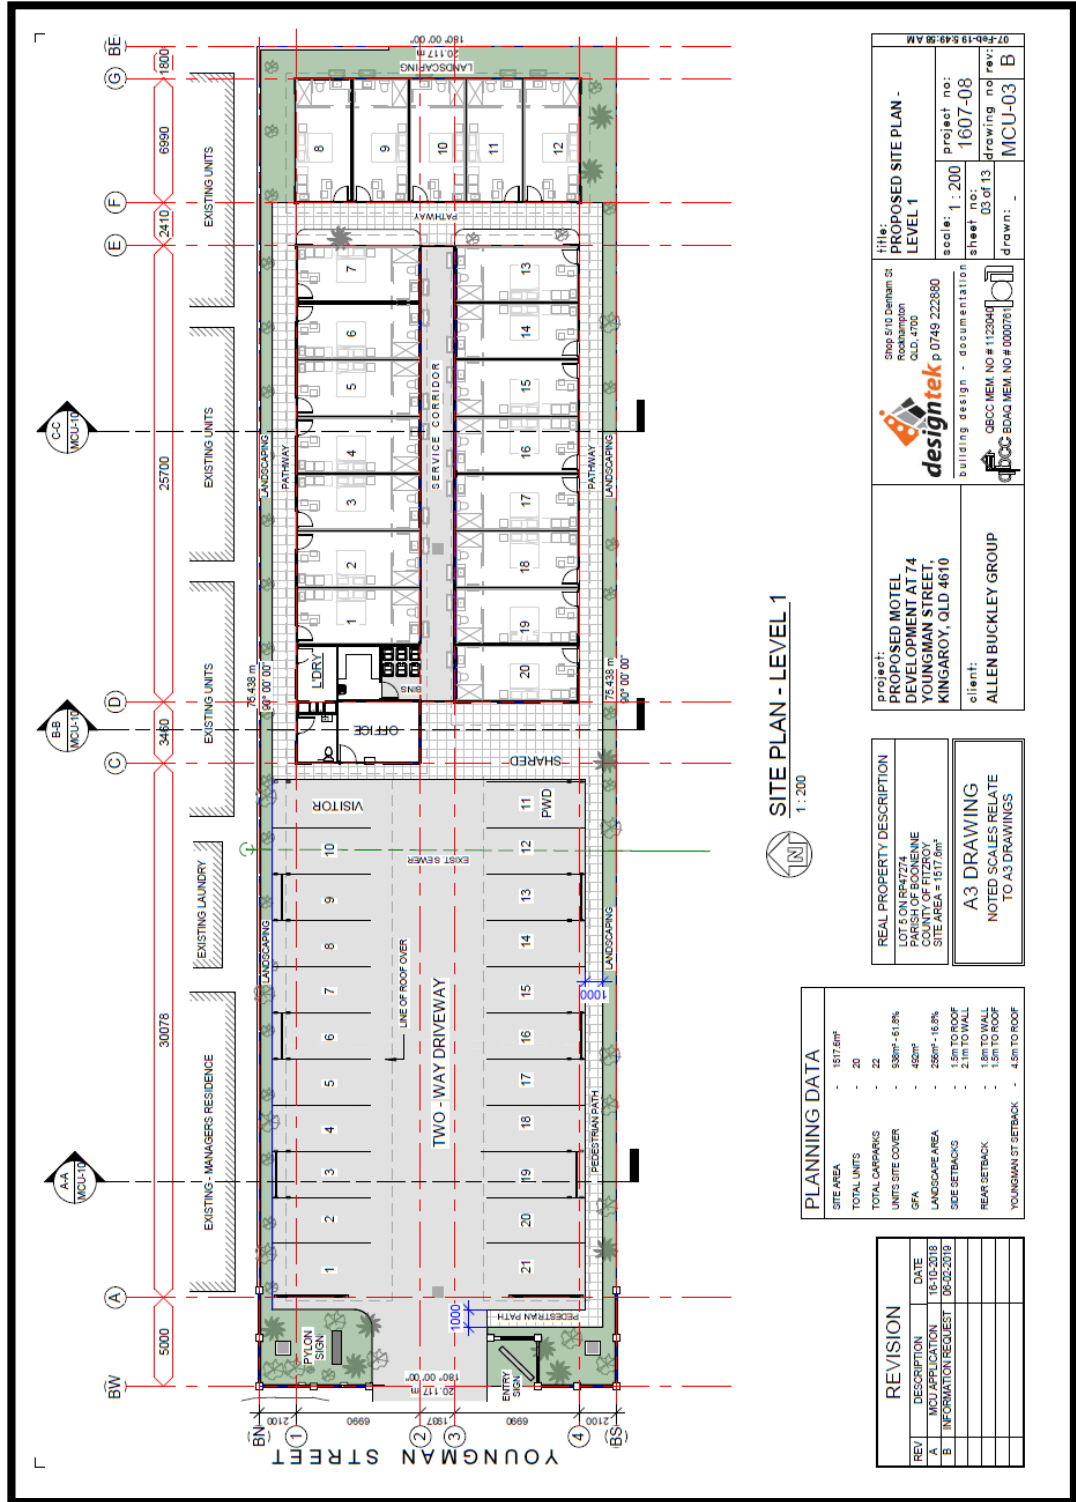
Amended Site Plan with Pedestrian Path, Source: Applicant
